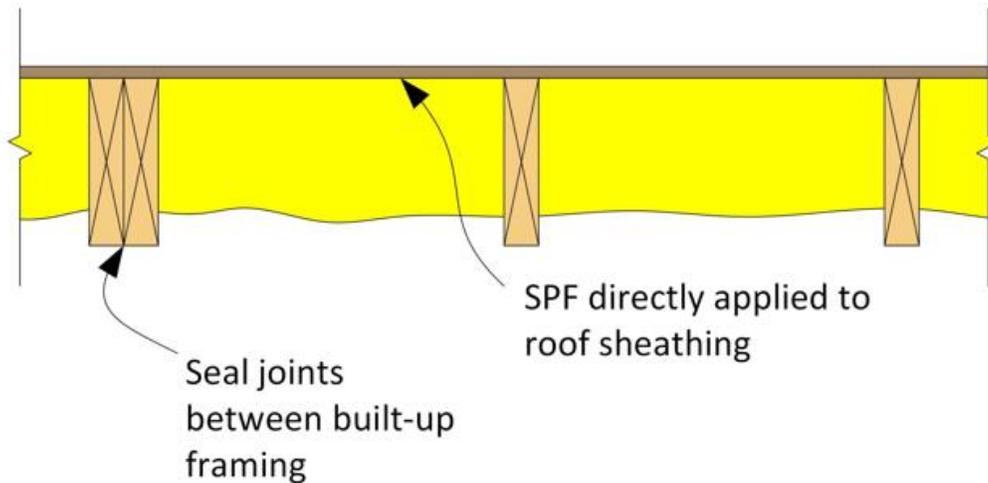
In many cases, such as cathedral ceiling rafters, it is not possible to encapsulate framing, with SPF, and the joint between built up framing must be sealed by alternative means continuously along the entire length. (credit image to SFC³)
